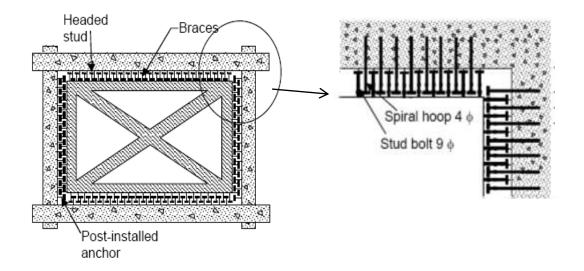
(a) Prefabricated bracing (b) Detailing of the corner view (Durgesh, 2004)
